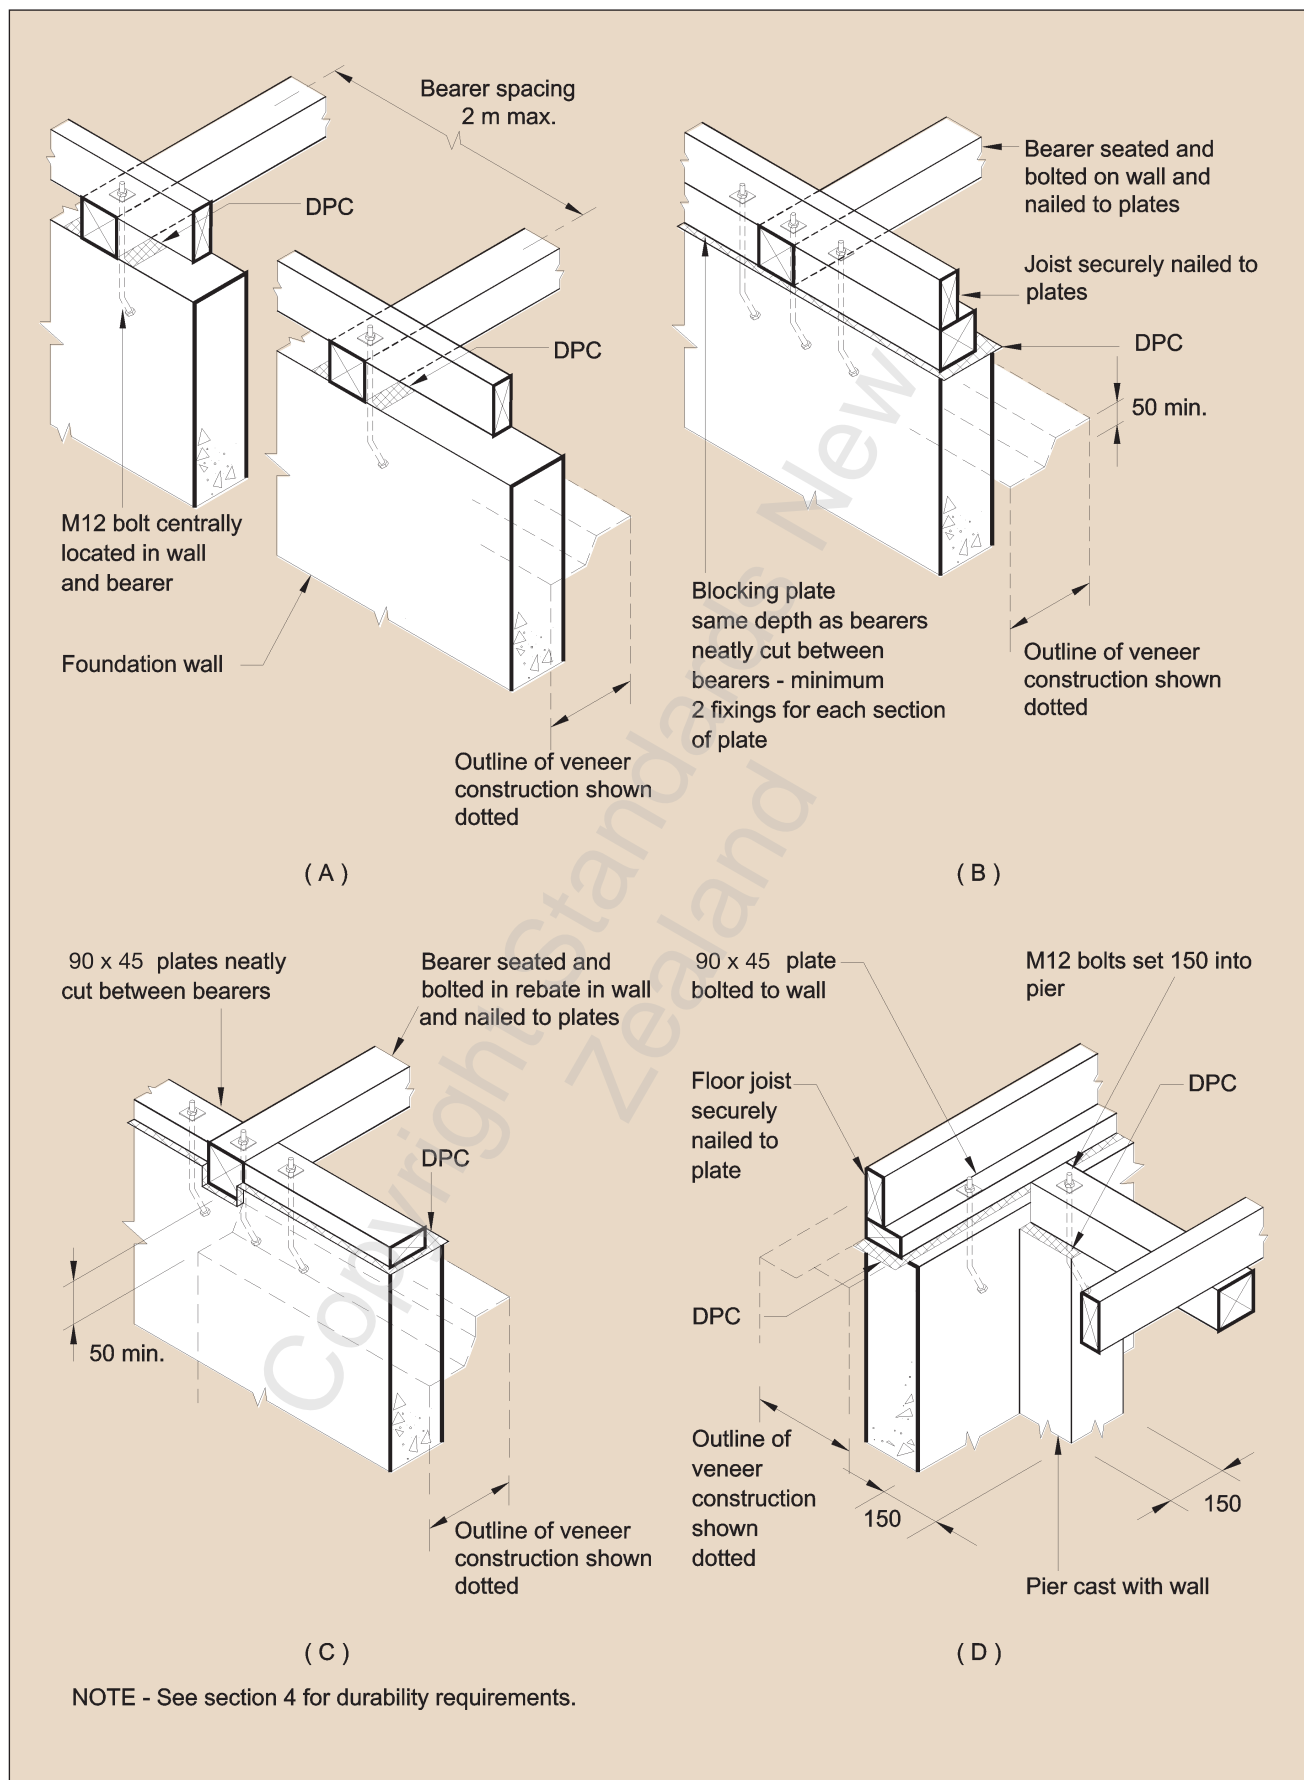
Fixing of bearers perpendicular to foundation walls (see 6.12.1)
